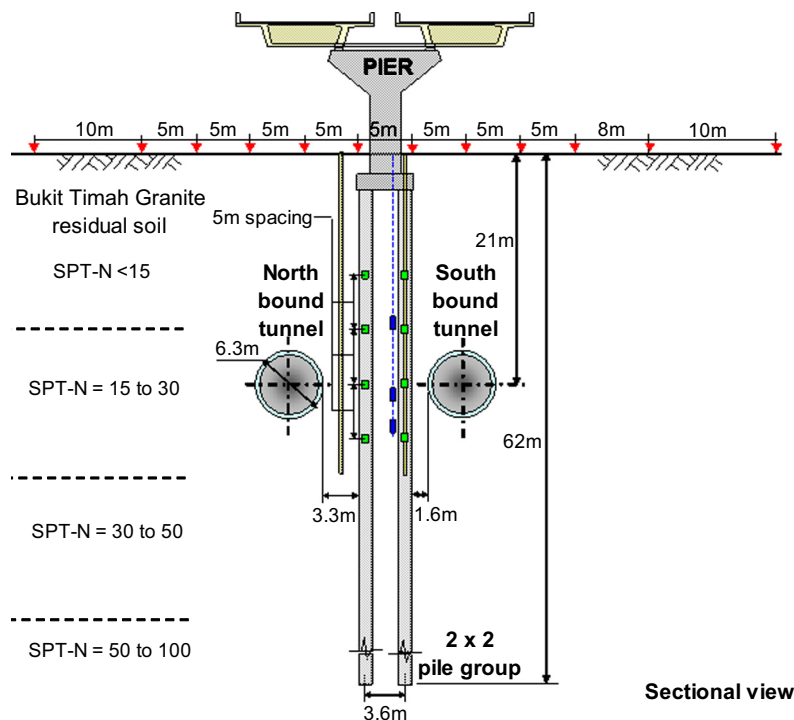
A sectional view showing an existing pile group subjected to side-by-side twin tunnelling in Singapore (Pang et al., 2005).
